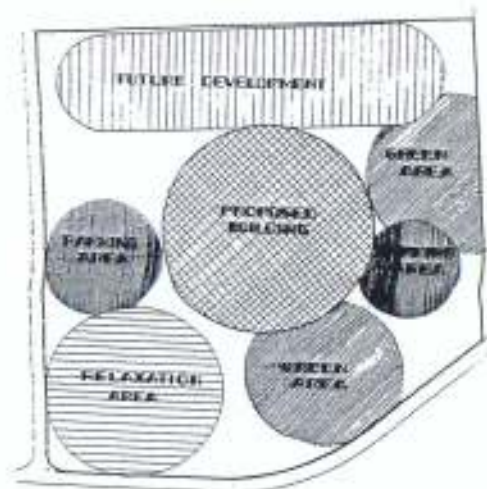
Showing Site Zonning Structure of the Proposal
